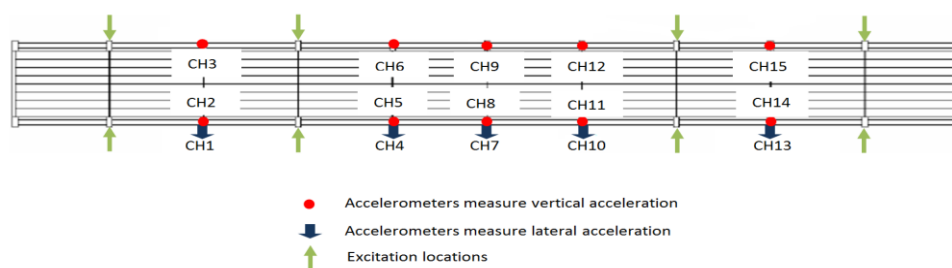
Accelerometer layout and excitation locations in the plan view of bridge deck
